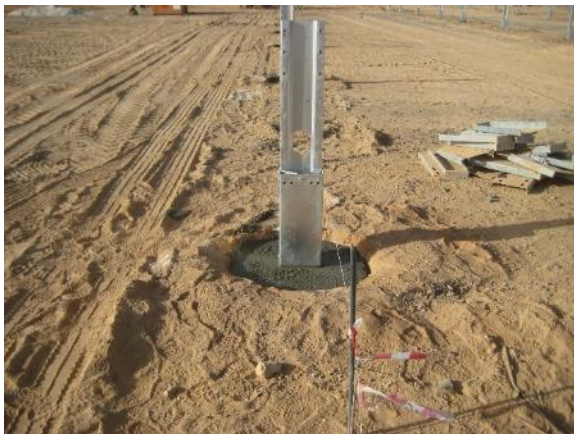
Mounting structure concrete foundation (Al- Ward Al Joury PV Plant –Jordan)
